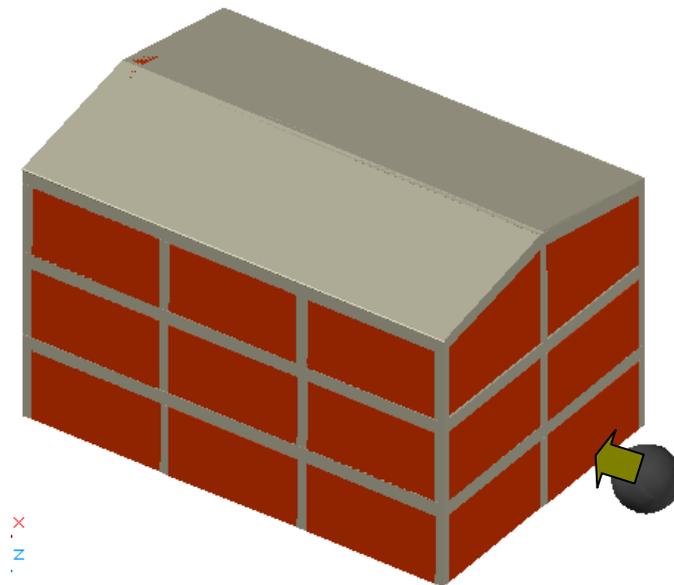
Rockfall impact on the basement of reinforce concrete frame structures
